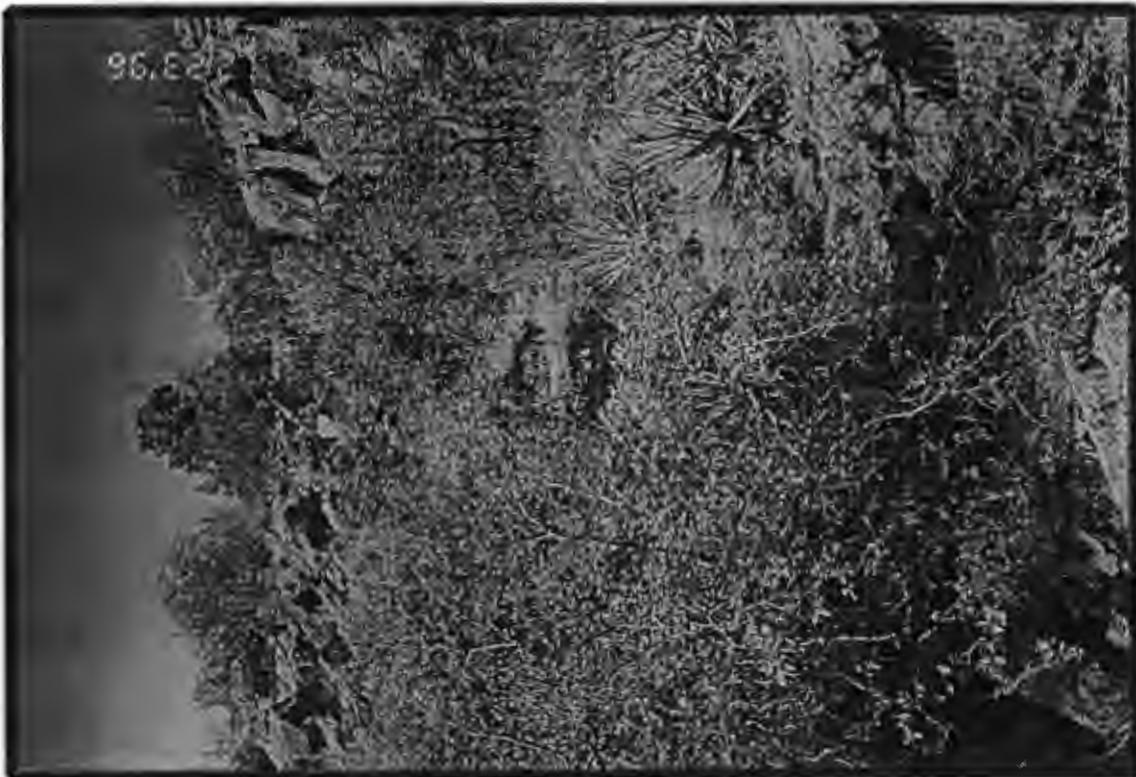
Looking S at straw-bale check dams put in place to assist with run-off control from the canyon bench area of PRS 32-002 (a, b). Note the roadway at bottom of LA Canyon.
